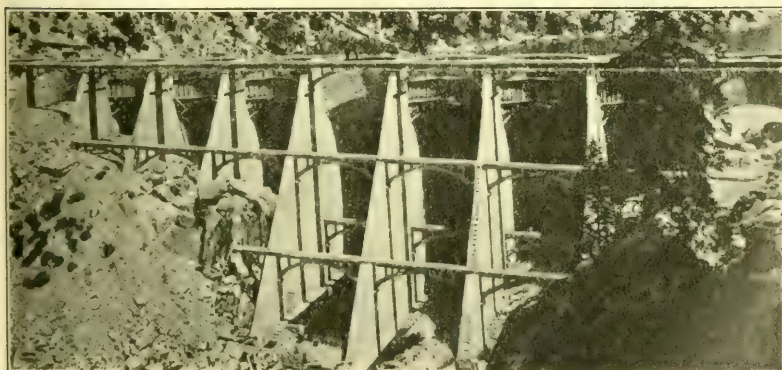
DOWN-STREAM VIEW OF NEW BIG BEAR VALLEY DAM.
